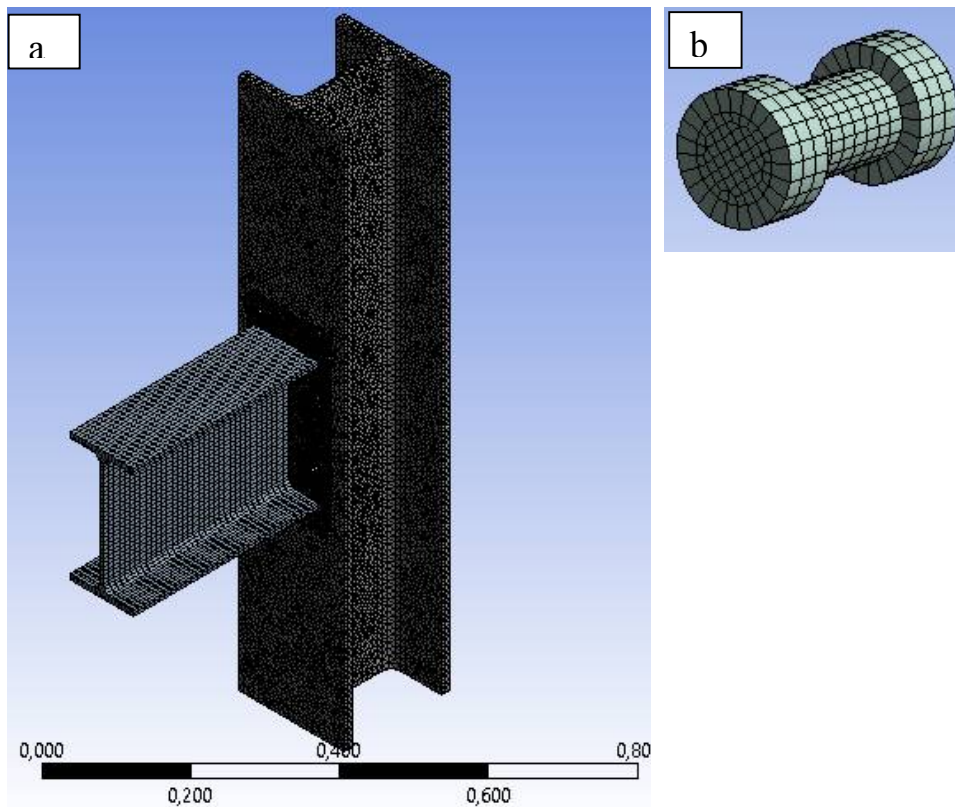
Finite element models: a) end plate-beam-to-column-connection, b) bolt
